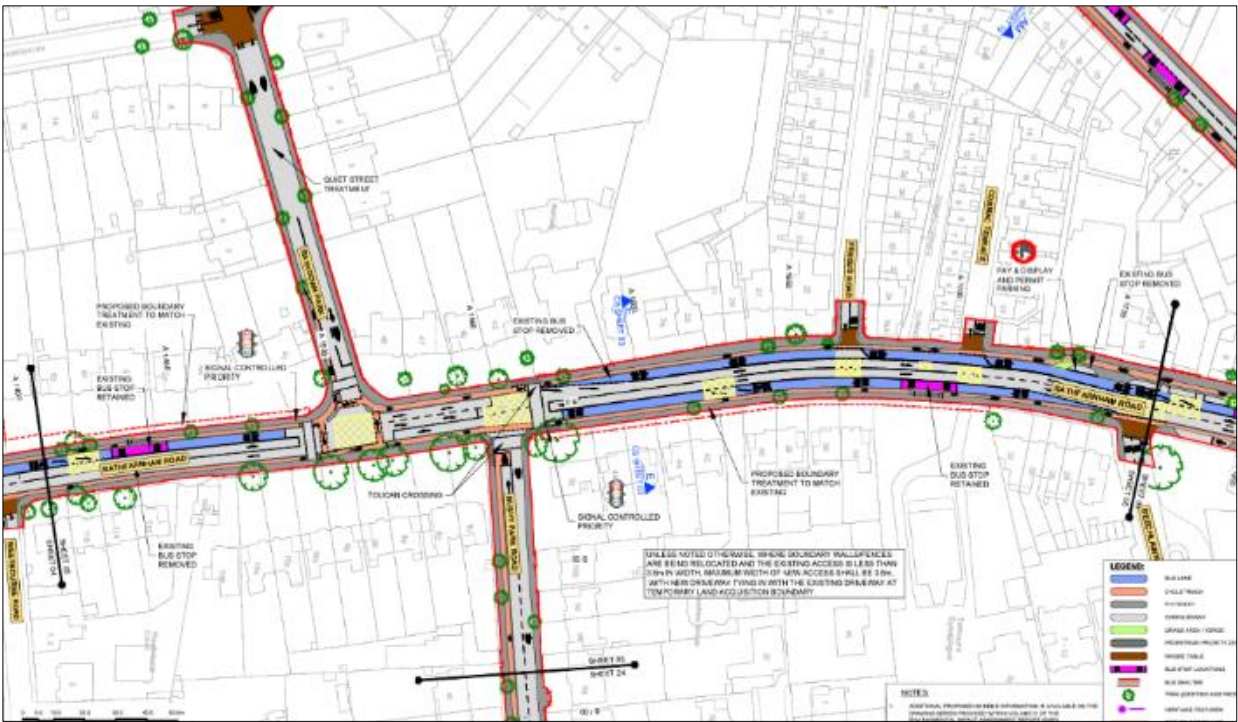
Extract from General Arrangement Drawings (Sheet 4)
